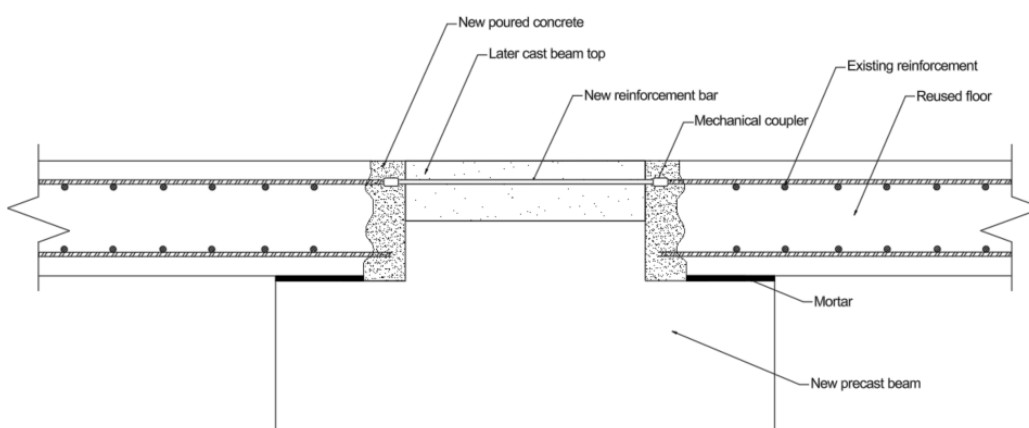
Design proposal of a fixed beam-slab connection option 2
